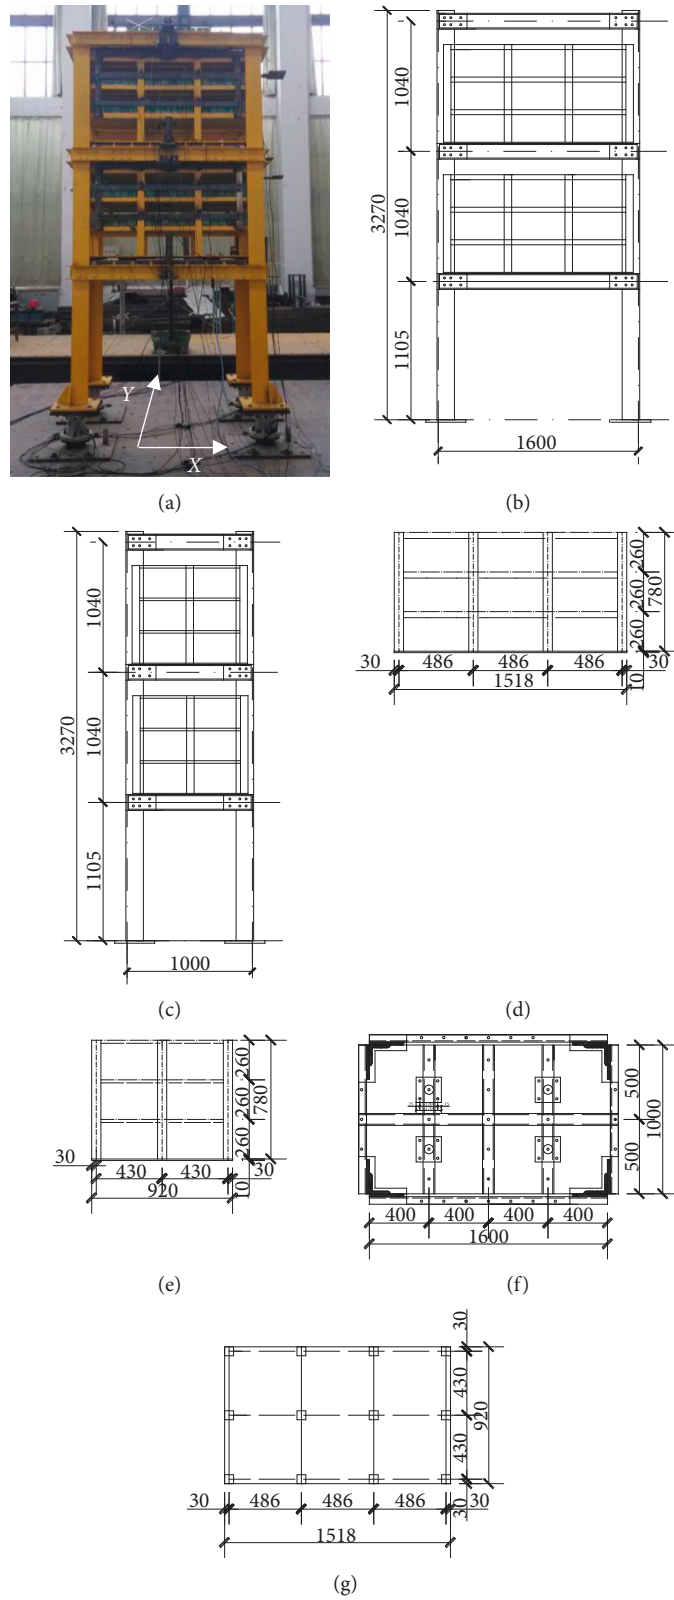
Mega-substructure model. (a) Picture of the mega-substructure, (b) front elevation of the mega-substructure, (c) side elevation of the mega-substructure, (d) front elevation of the subframe, (e) side elevation of the subframe, (f) plan of the main frame, and (g) plan of the subframe.
